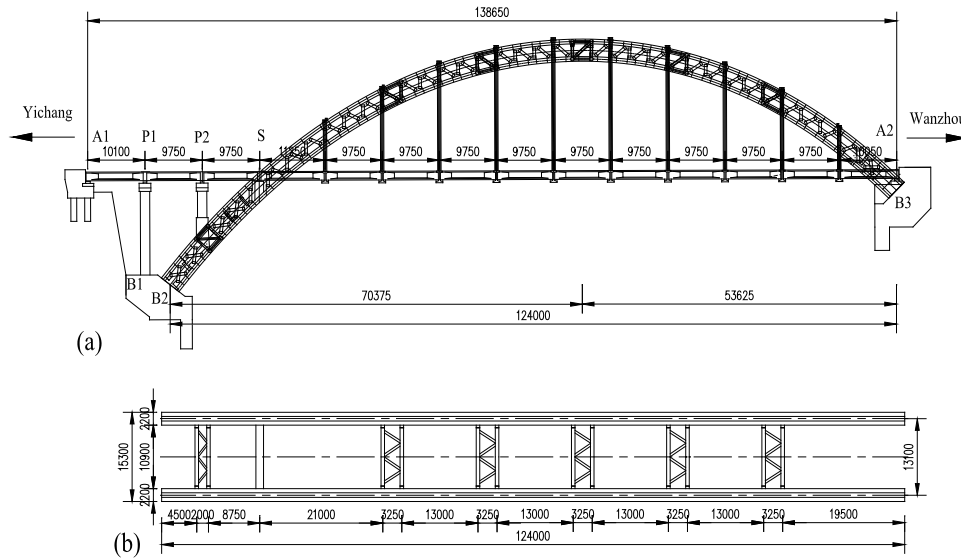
(a) Elevation view of the bridge, (b) plan view of the arch structure (unit: mm)
